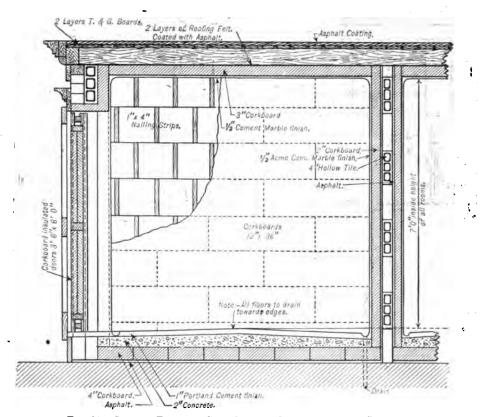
Section Through Cold Storage Room for Hotel Plant.
